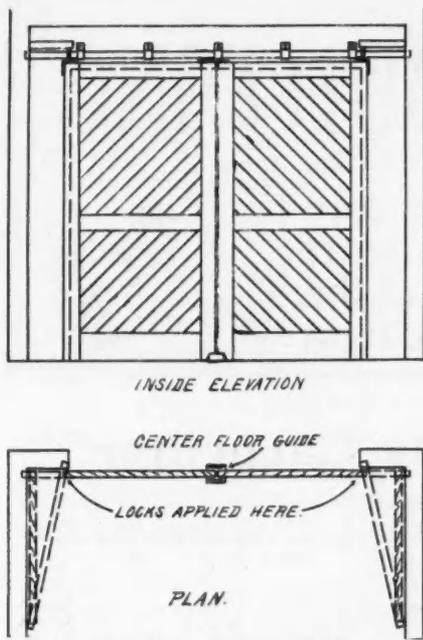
Elevation and Plan of Pair of Right Angle Garage Doors.
